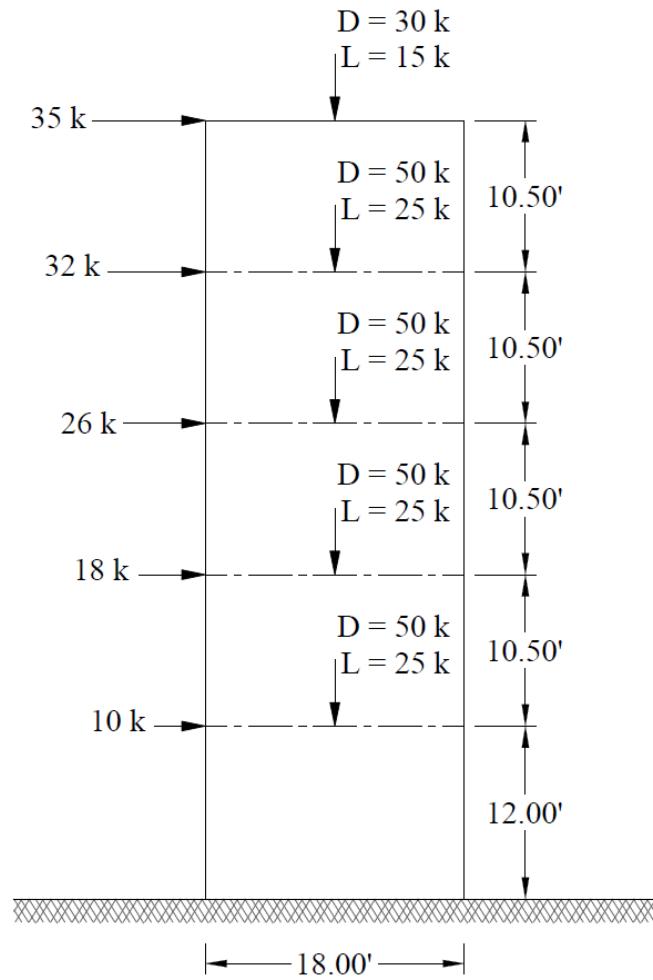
Reinforced Concrete Shear Wall Geometry and Loading
